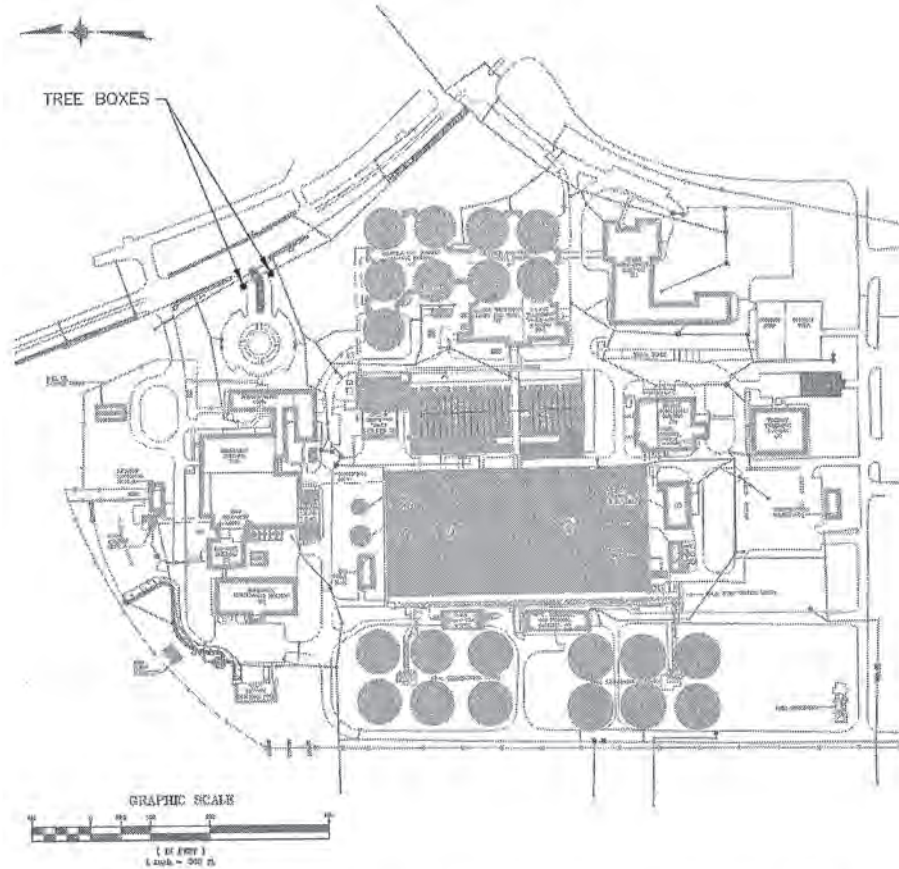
Cedar Creek WPCP Tree Box Location Site Plan
